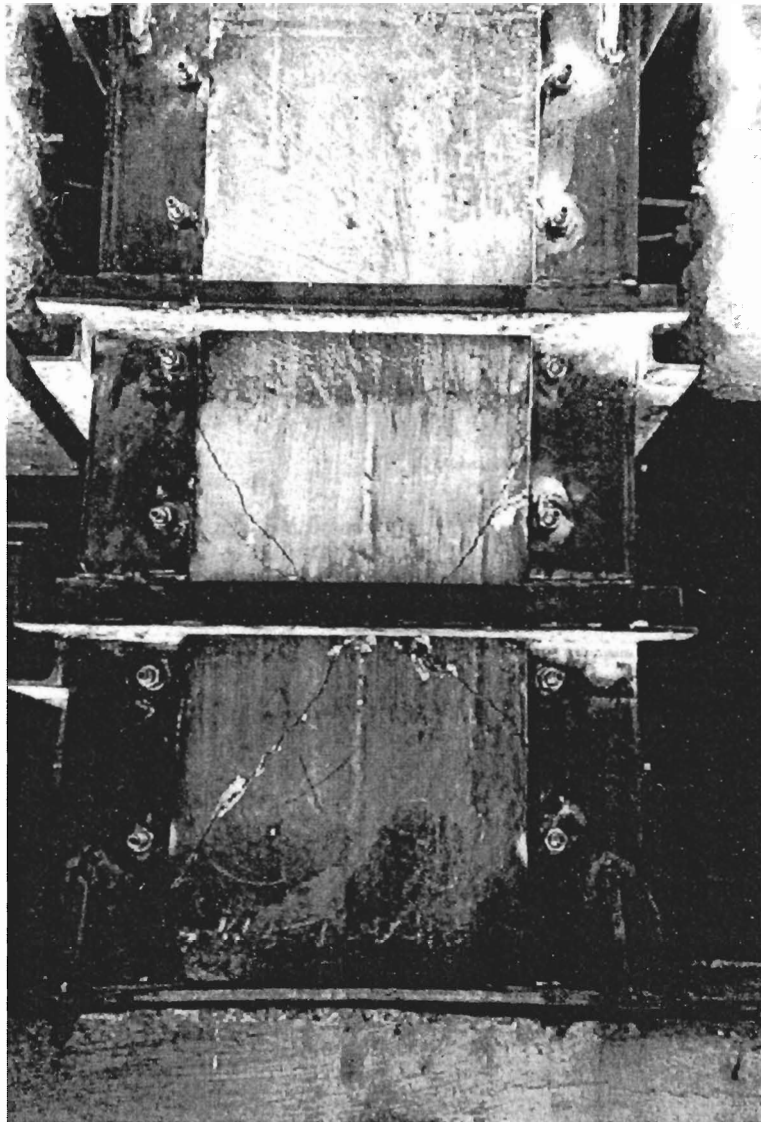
Repair and strengthening of short column damaged in shear in Fabriano
